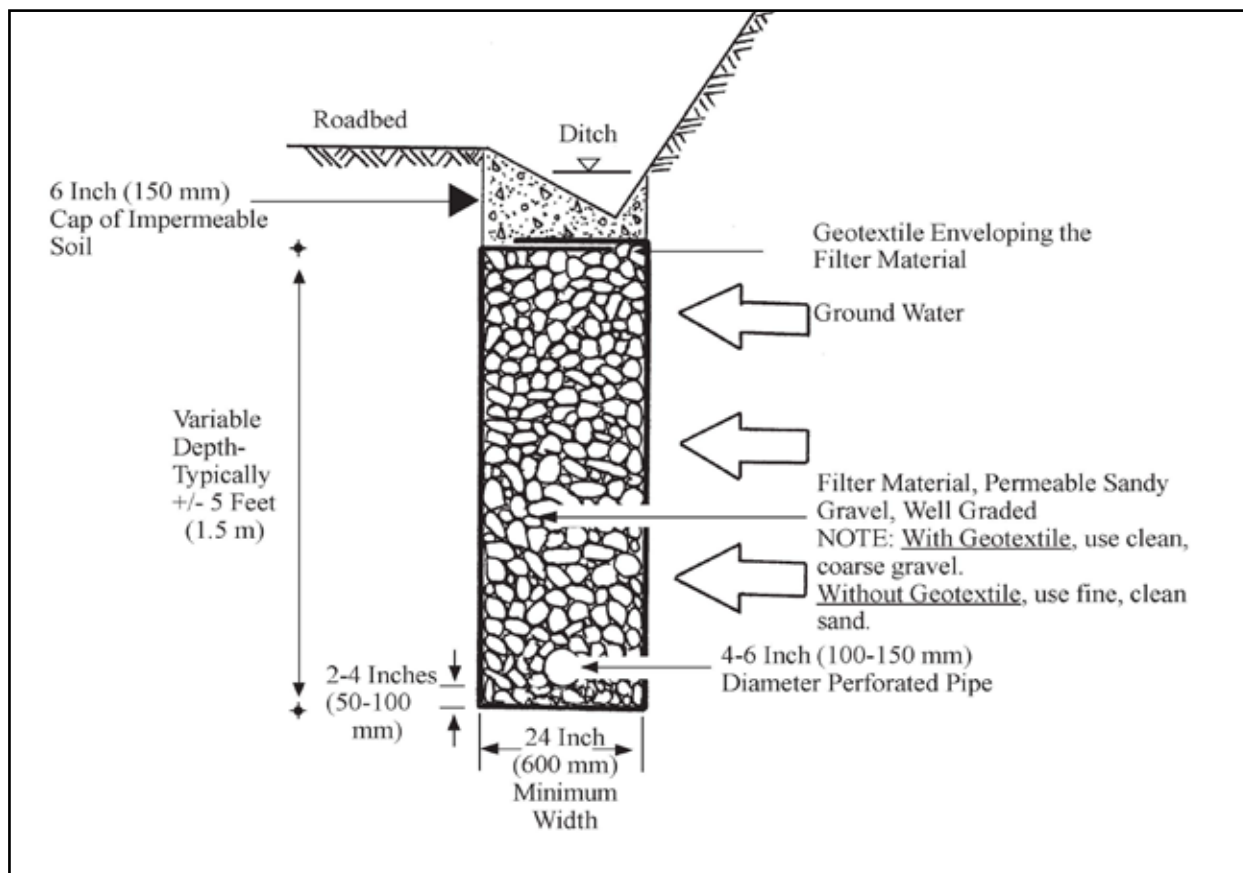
Typical road underdrain or trench drain, enveloped in a geotextile, used to remove subsurface water.
